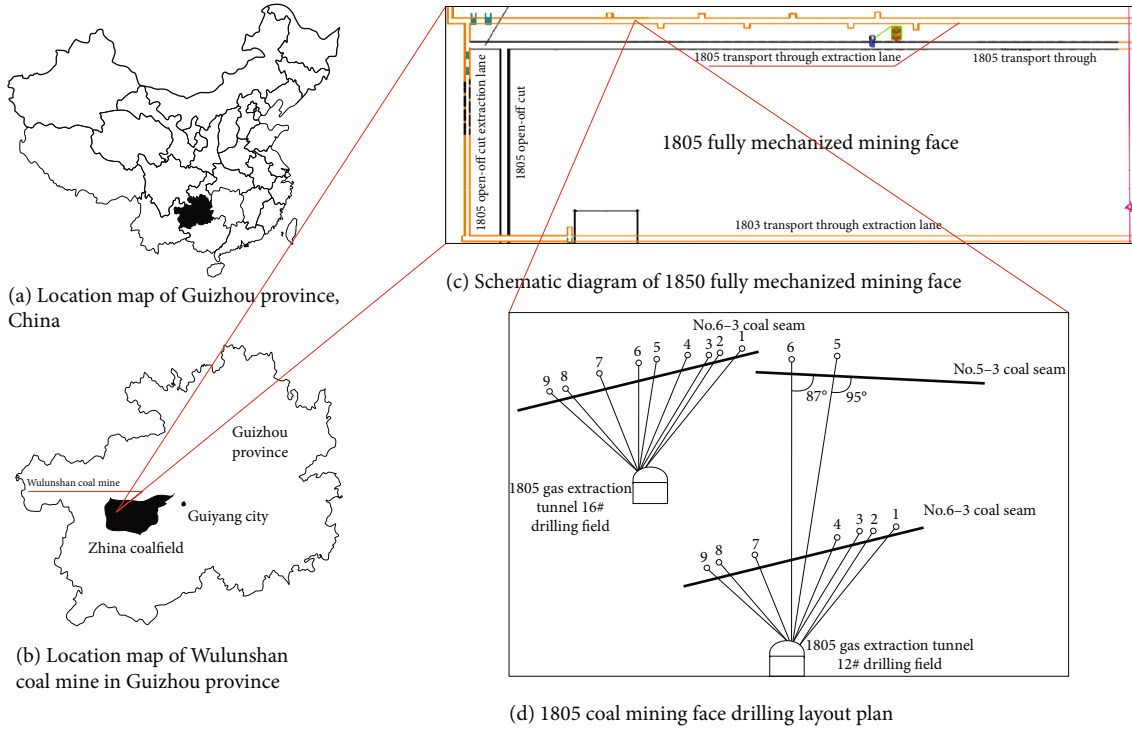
Layout drawing of drilling in the underground coal mine.
